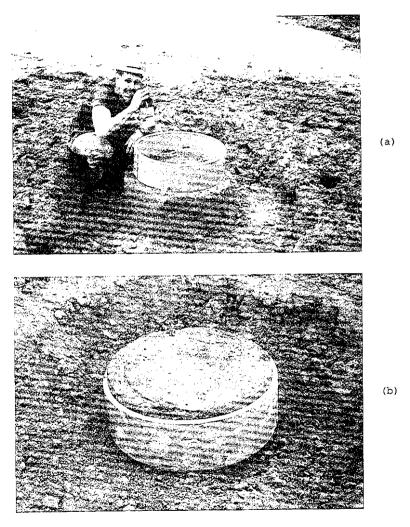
Placement of ring on soil surface (a) and ring trimmed over specimen to be sampled (b).
